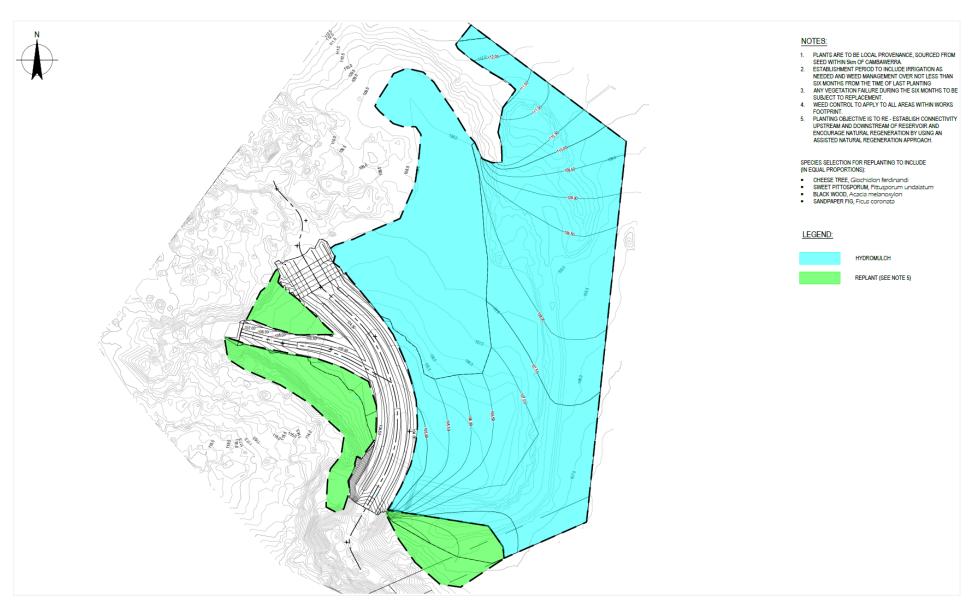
Planting plan (detailed design drawing 12628715-E001)
